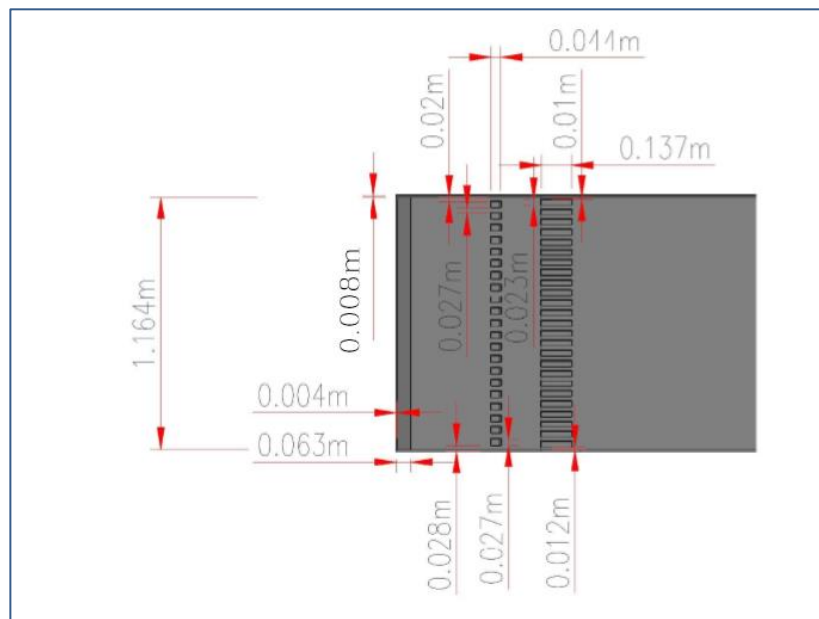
The detail dimension of baffle blocks in stilling basin.
